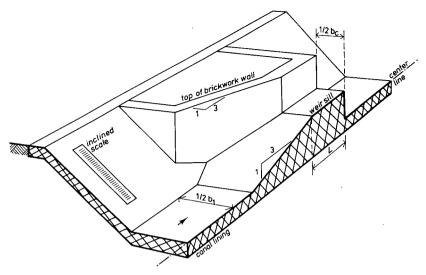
Structure with rectangular control section in lined trapezoidal canal.
